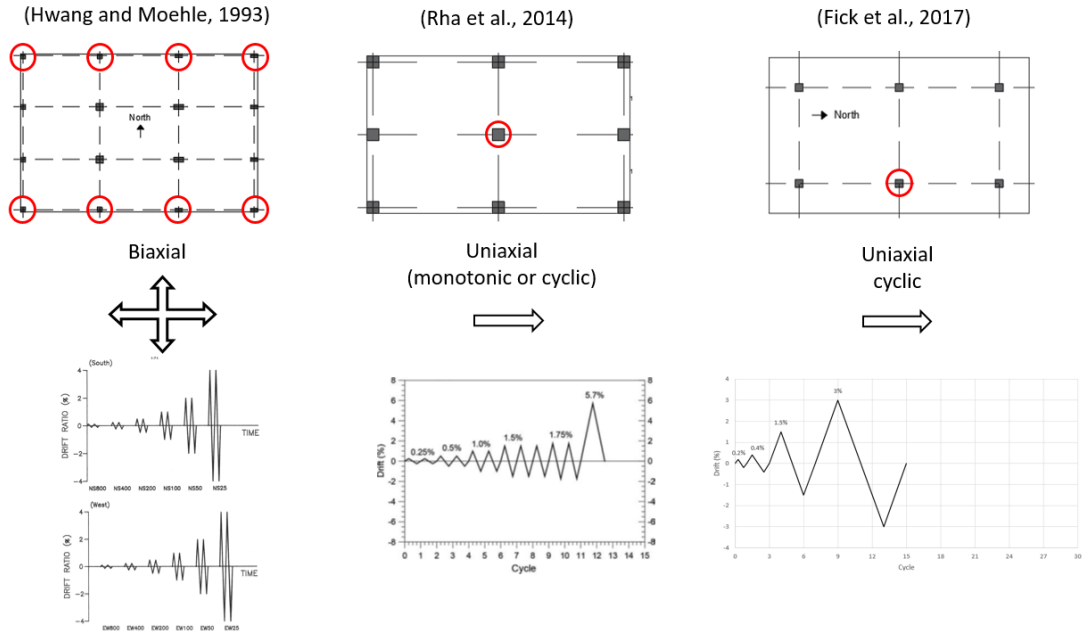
Geometry, load application and first connections failed for the flat slab floors and multi-storey frame experiments.
